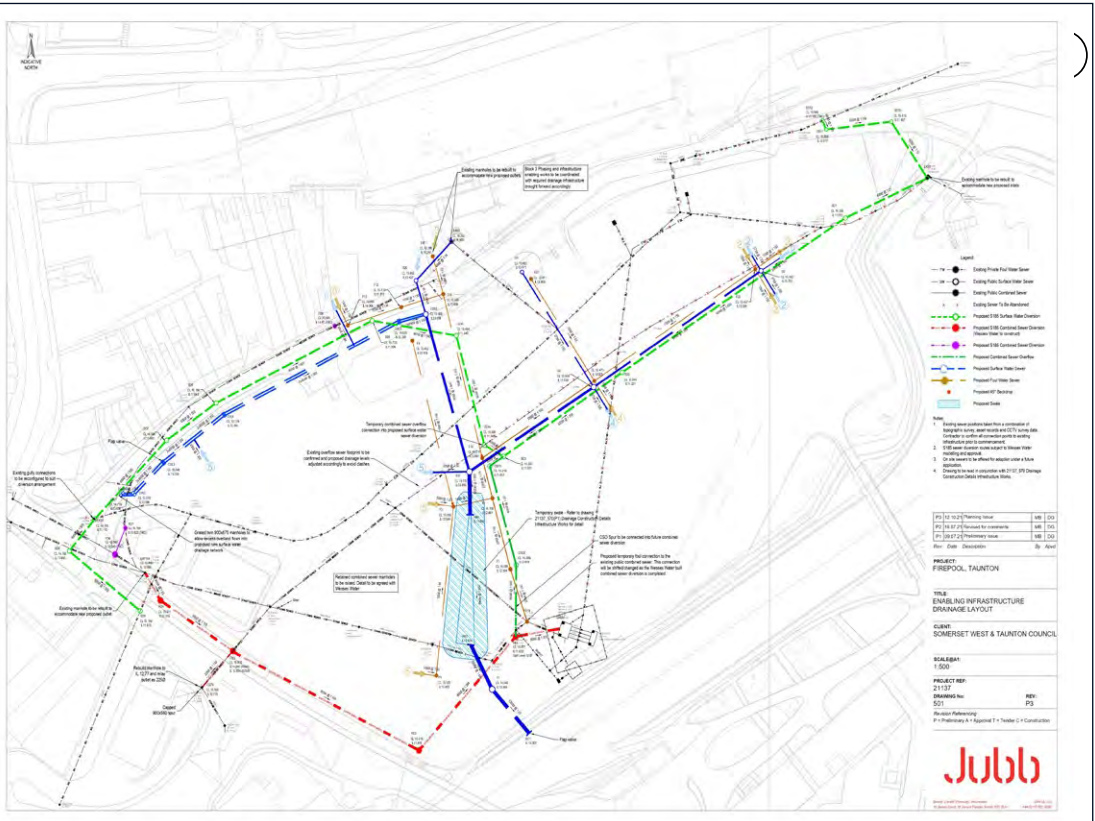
JUBB Enabling Infrastructure Drainage Layout
